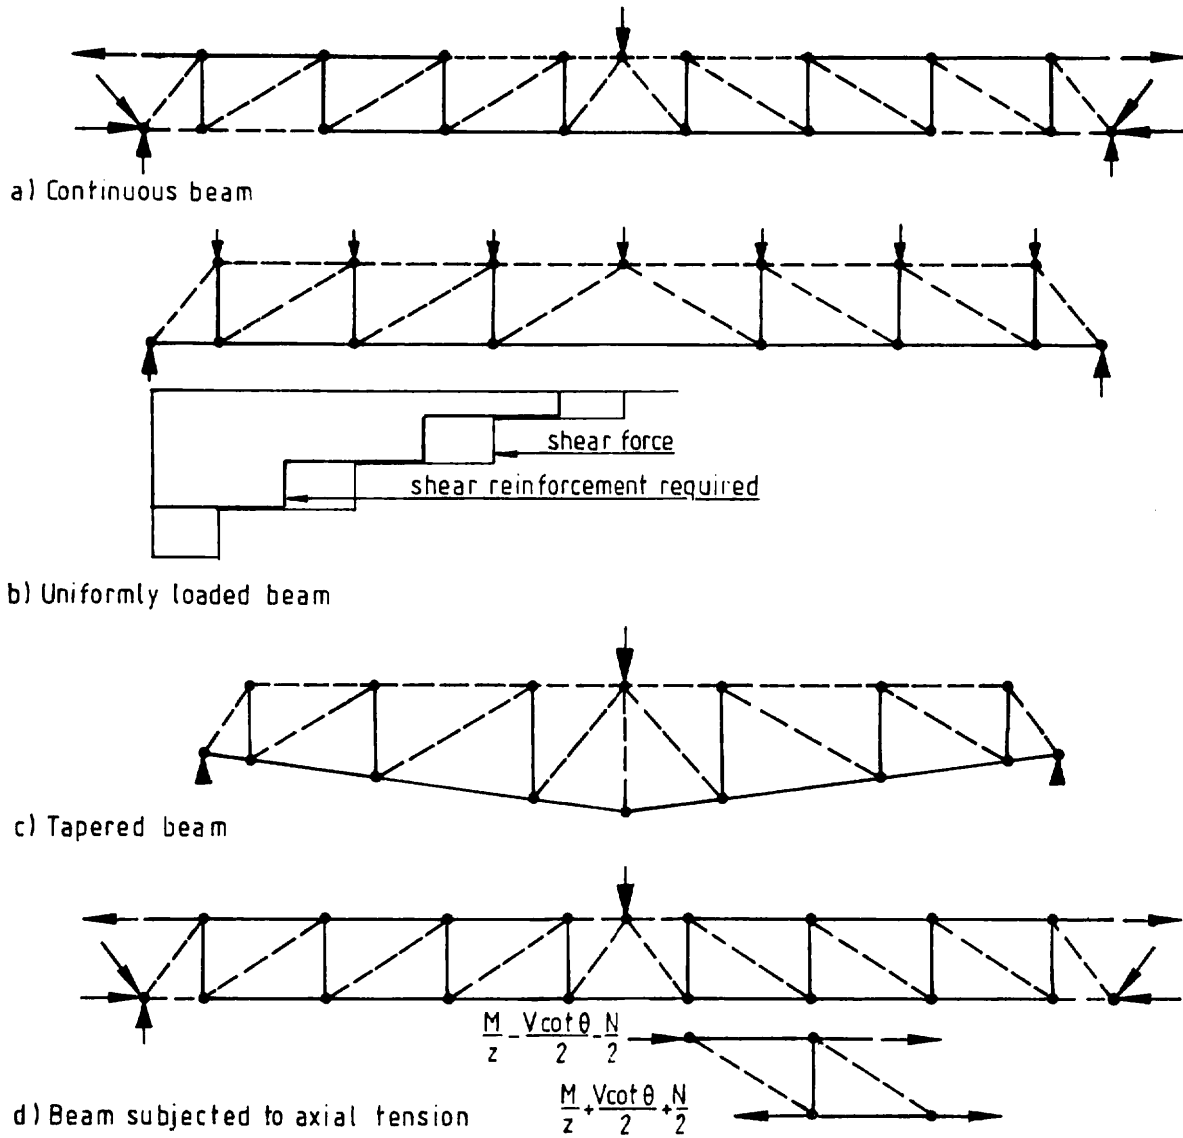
Examples of truss models for beams subjected to bending and shear
